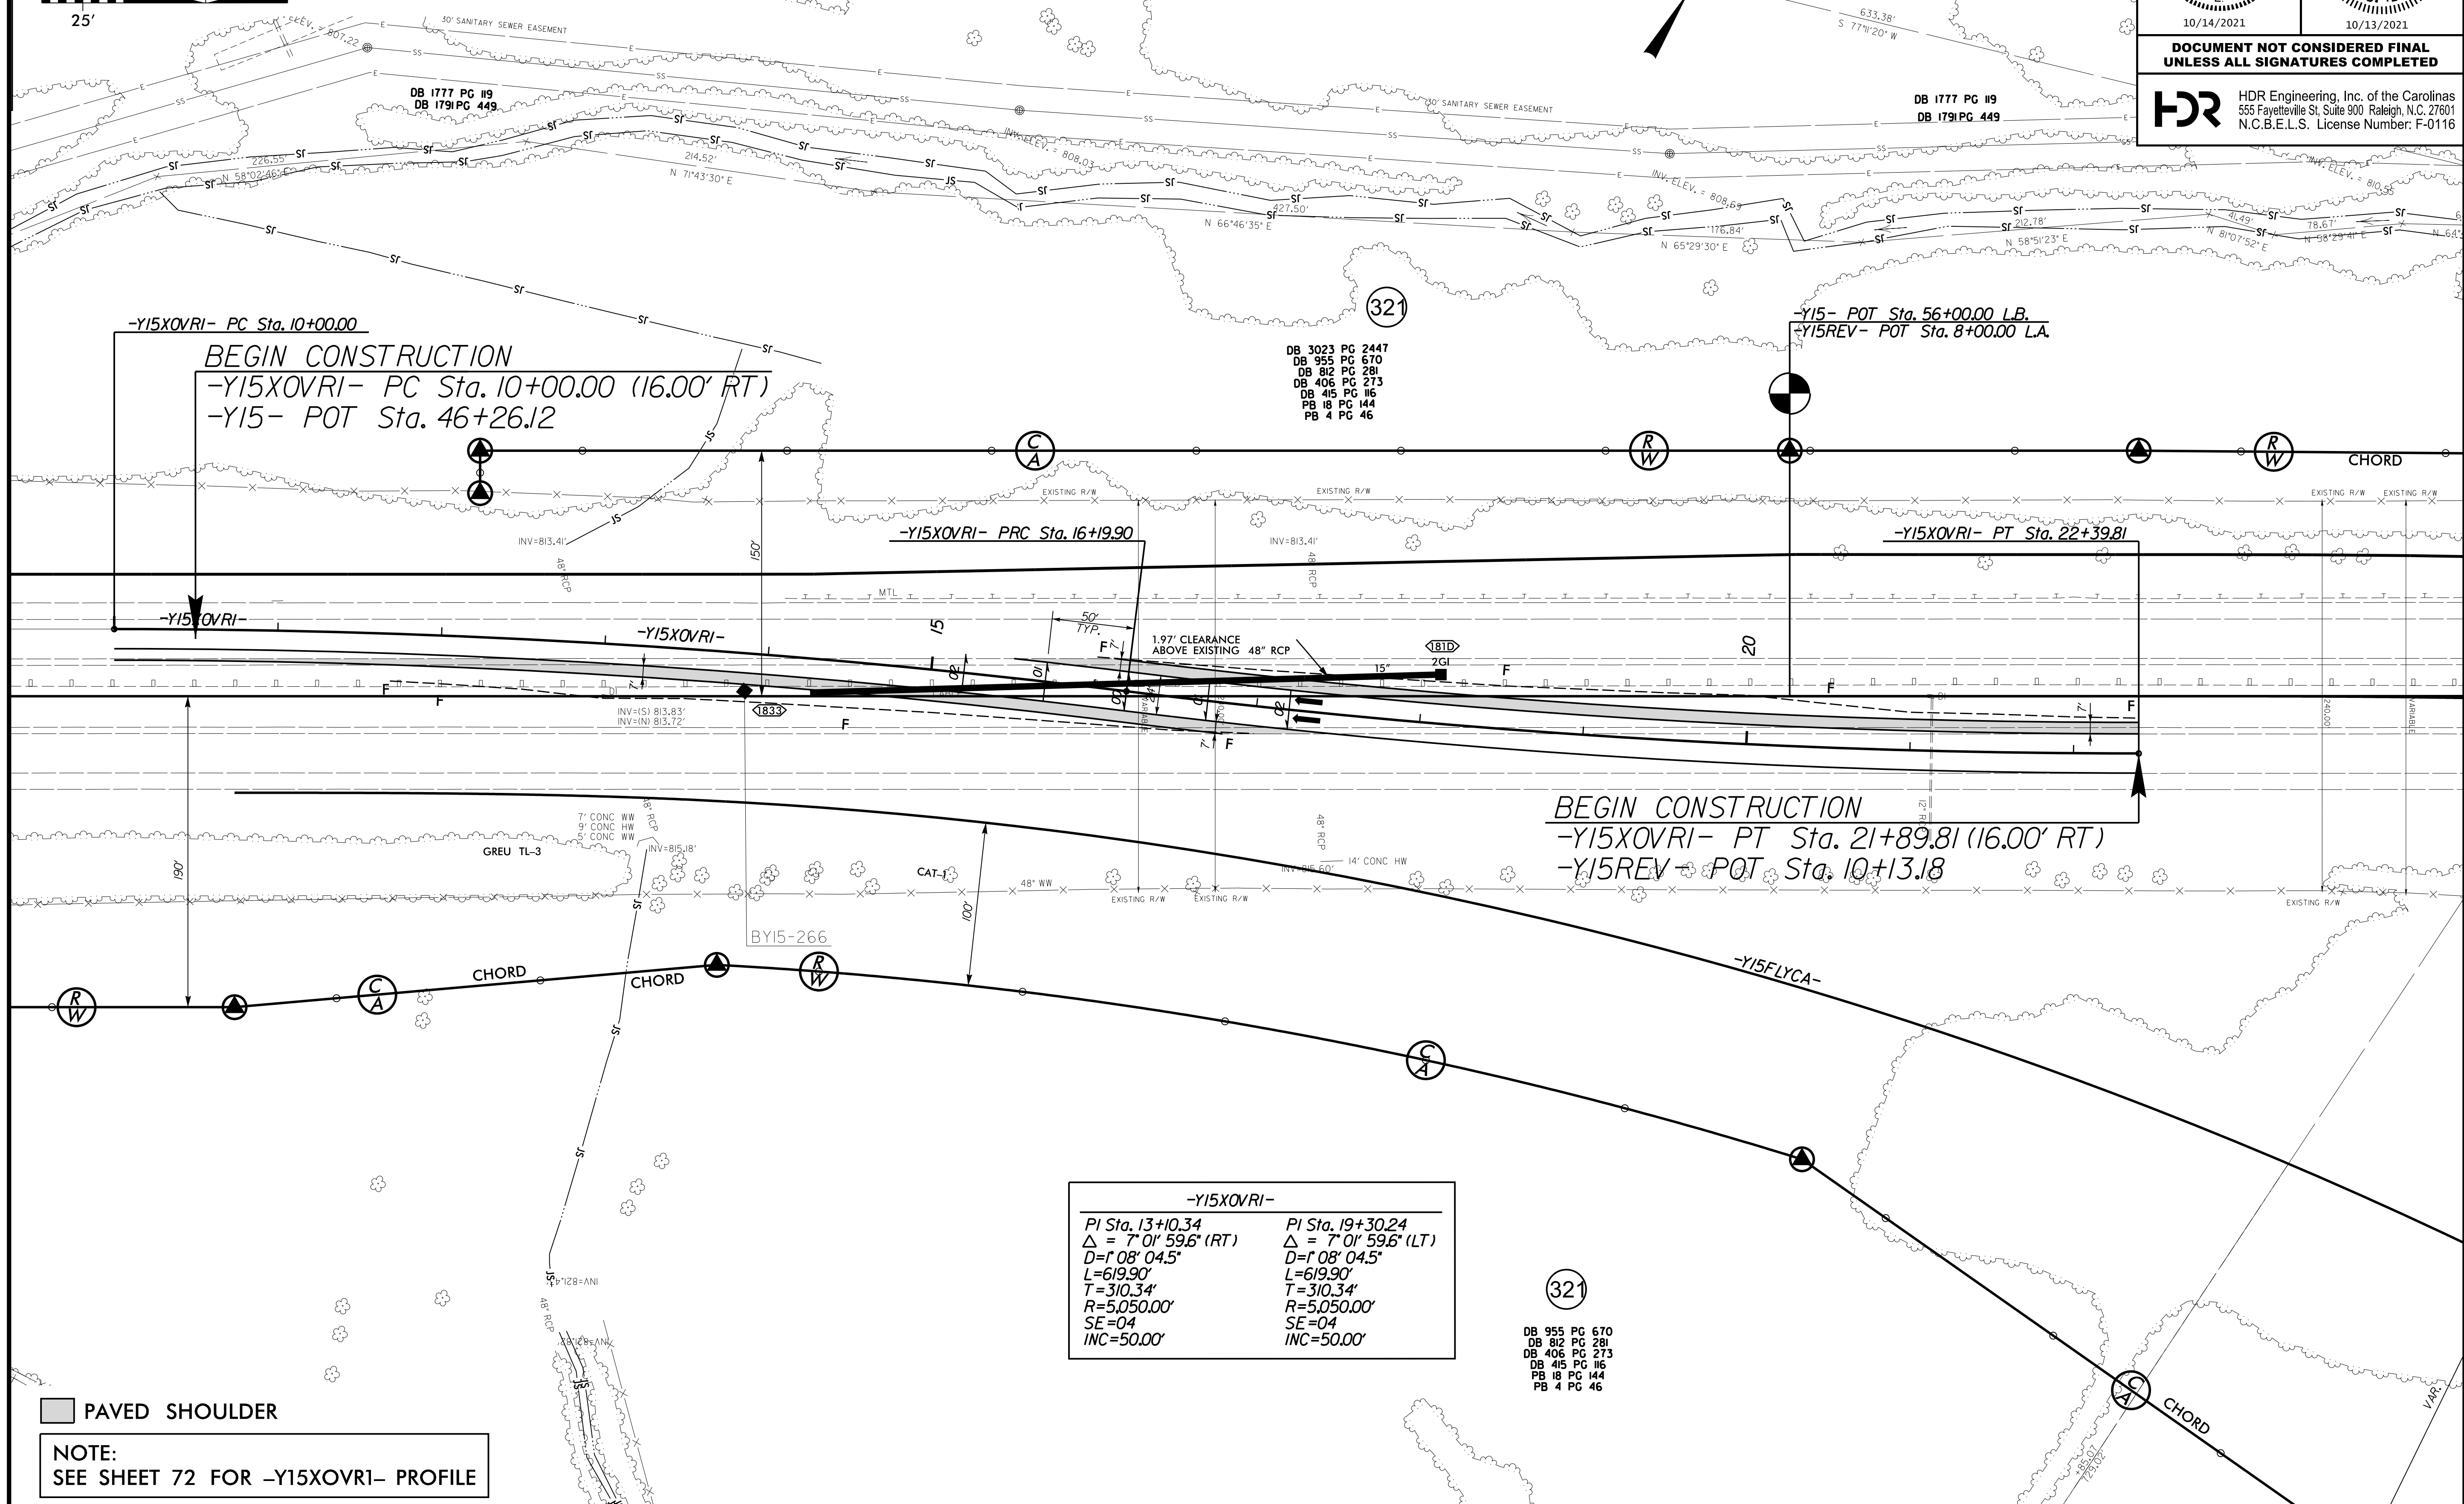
XOVRI- ON-SITE DETOUR
